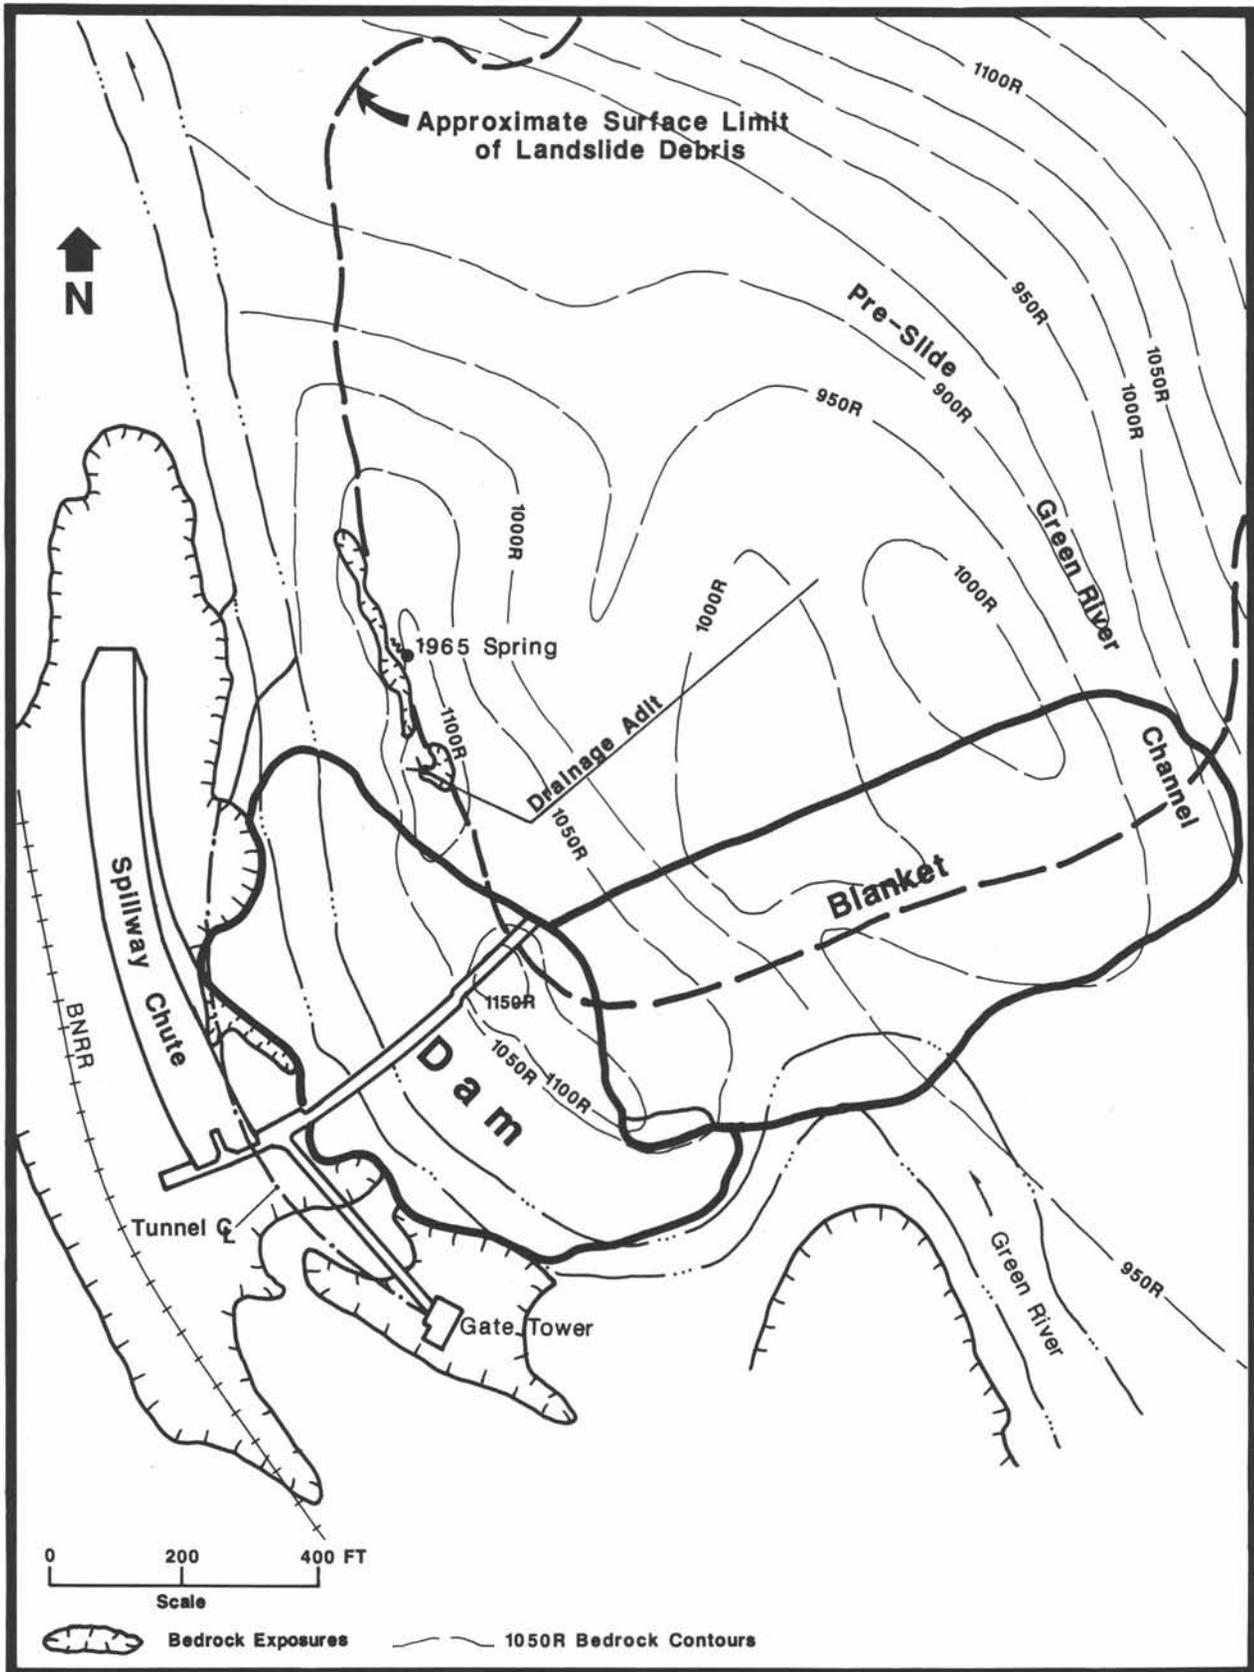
General site geology and plan of Howard Hanson Dam and ancillary features.
